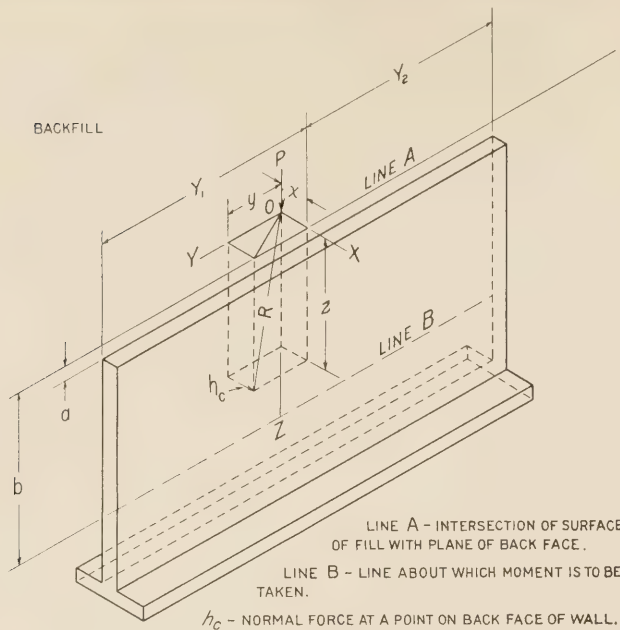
DIAGRAM SHOWING RETAINING WALL AND LOAD ON BACKFILL.
